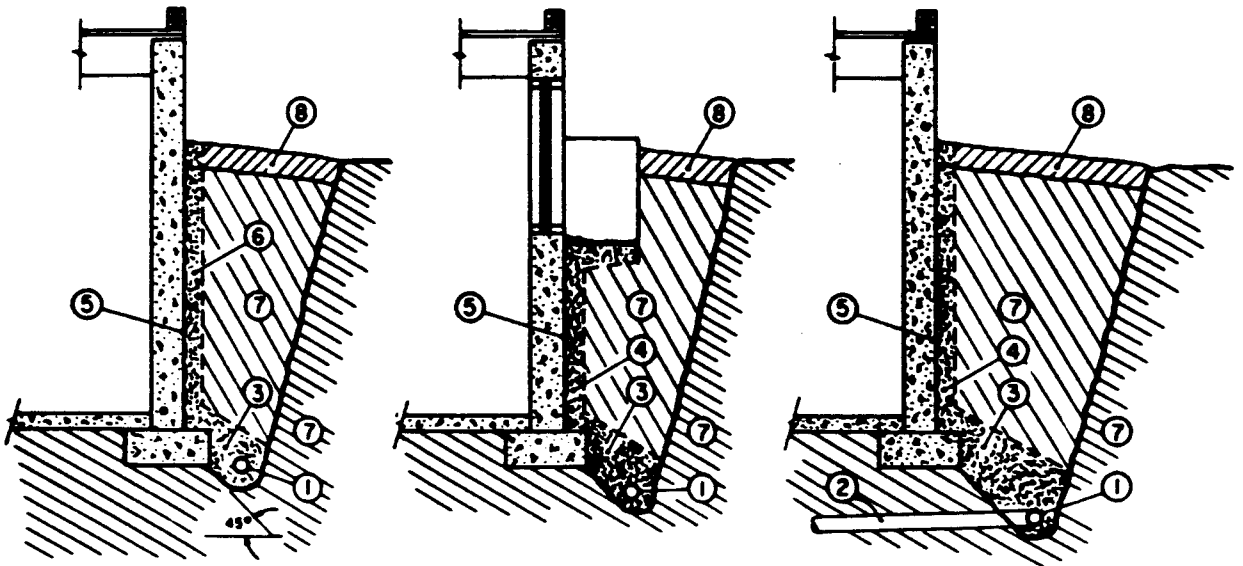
Typical sections showing arrangement of subsurface perimeter drains around shallow foundations.
